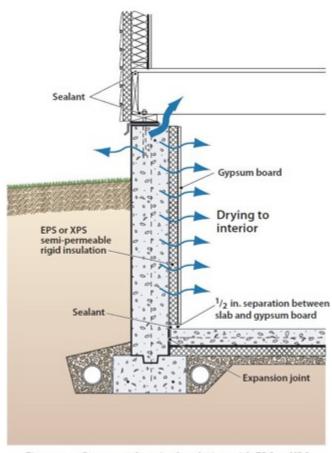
Basement Interior Insulation with EPS or XPS Semi-permeable Insulation on Inside Wall
